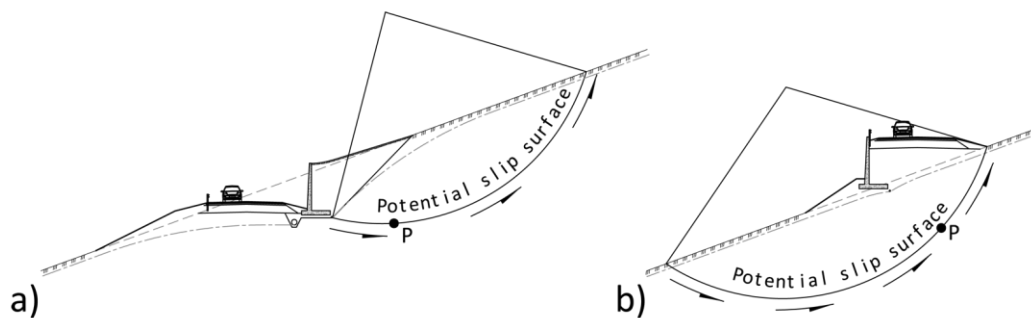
Proposed road section in a cut(a) and a fill(b) and resulting failure surfaces.
